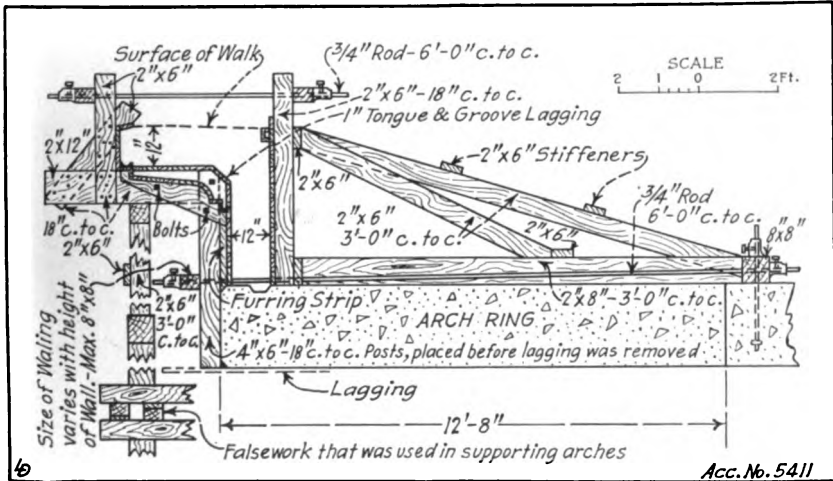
FORMS AND SYSTEM OF BRACING FOR SPANDEL WALLS OF BLACK STREET BRIDGE
